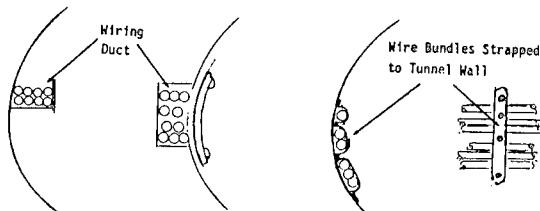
METHODS OF INSTALLING WIRE AND CABLE IN TUNNELS
